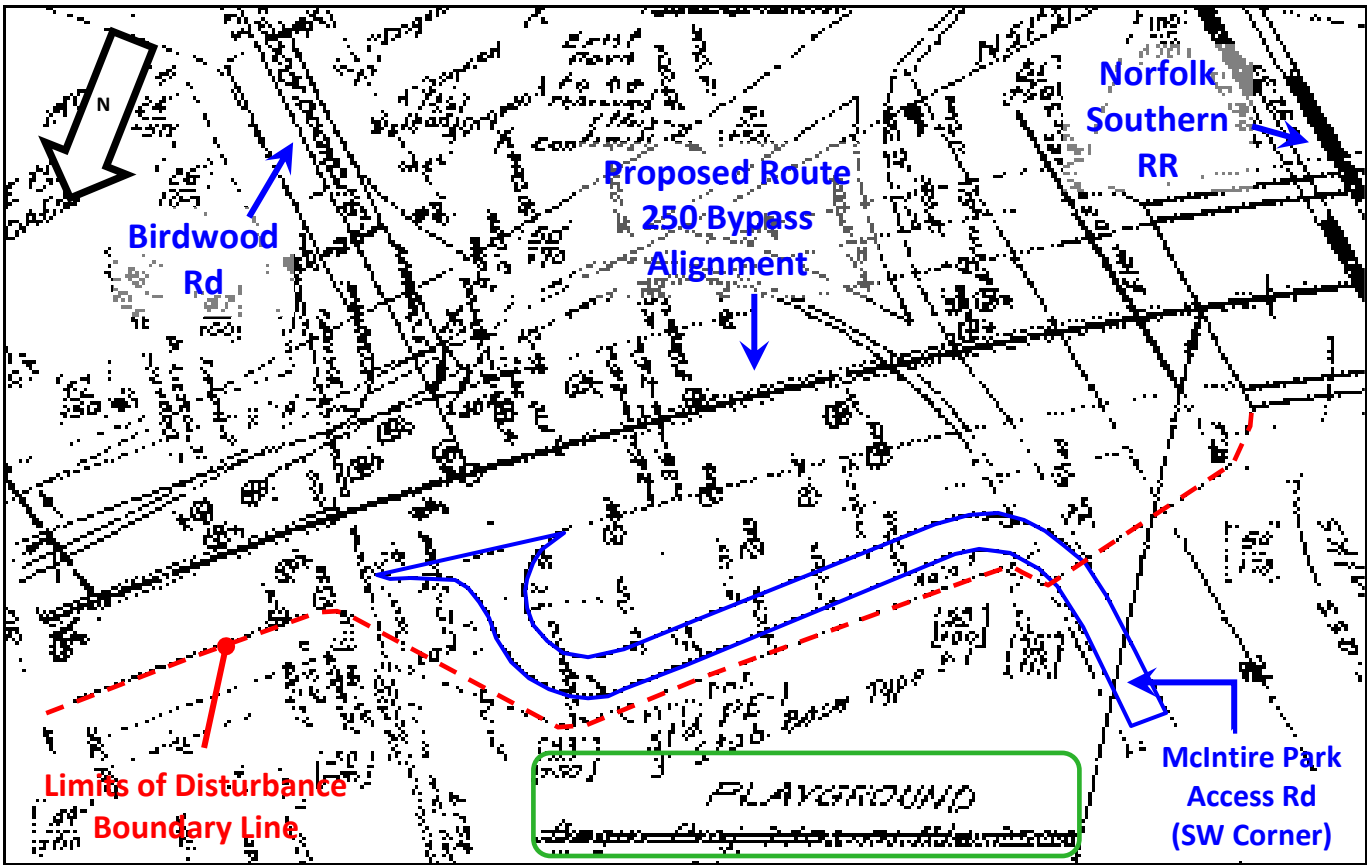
1957 Virginia State Highway Map Showing Existing Conditions and Proposed Work Along Rugby Avenue in Connection with Route 250 Bypass Construction (State Highway, Sheet 10 of 16).
